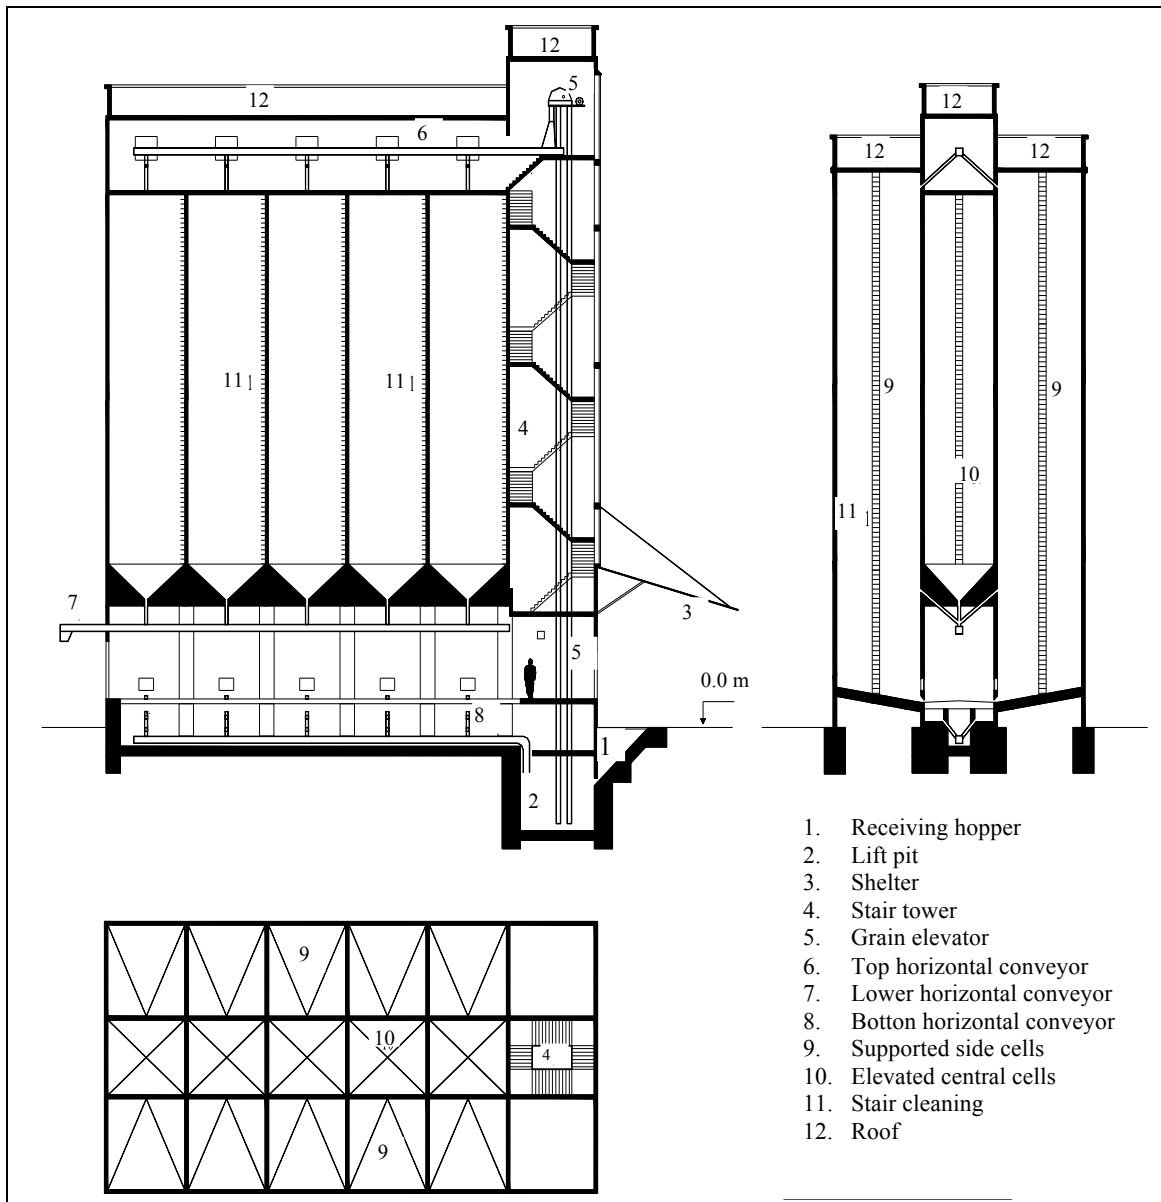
Section and plant of a typical silo type D (SNT, 1947).
